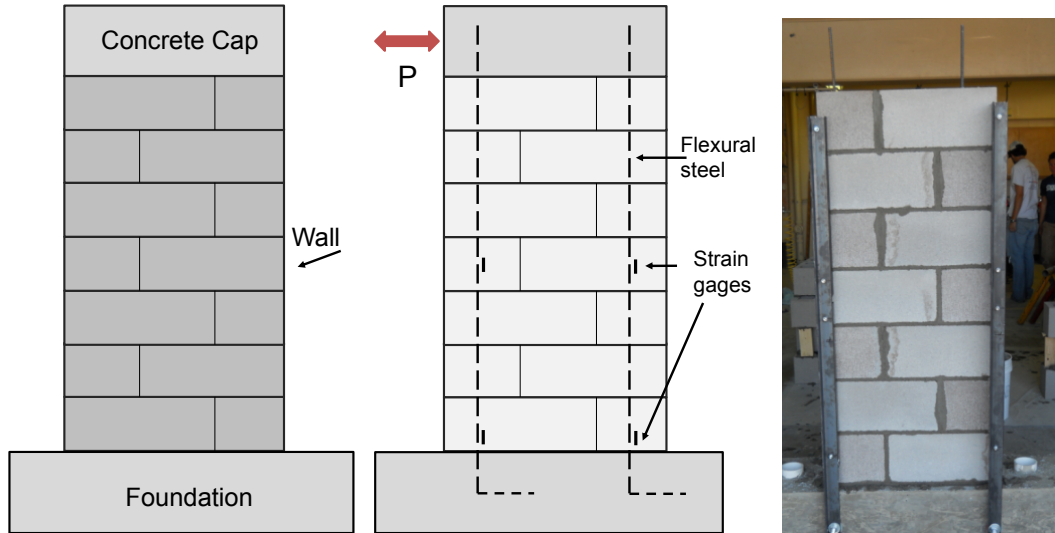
a) Specimen 2 illustration b) steel and strain gage placement and c) constructed wall
